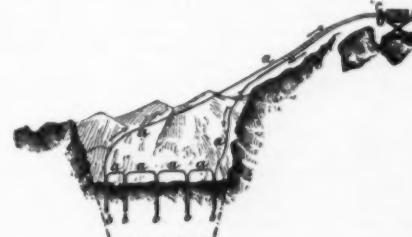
ARRANGEMENT OF THE APPARATUS FOR BLASTING IN A SHAFT.
